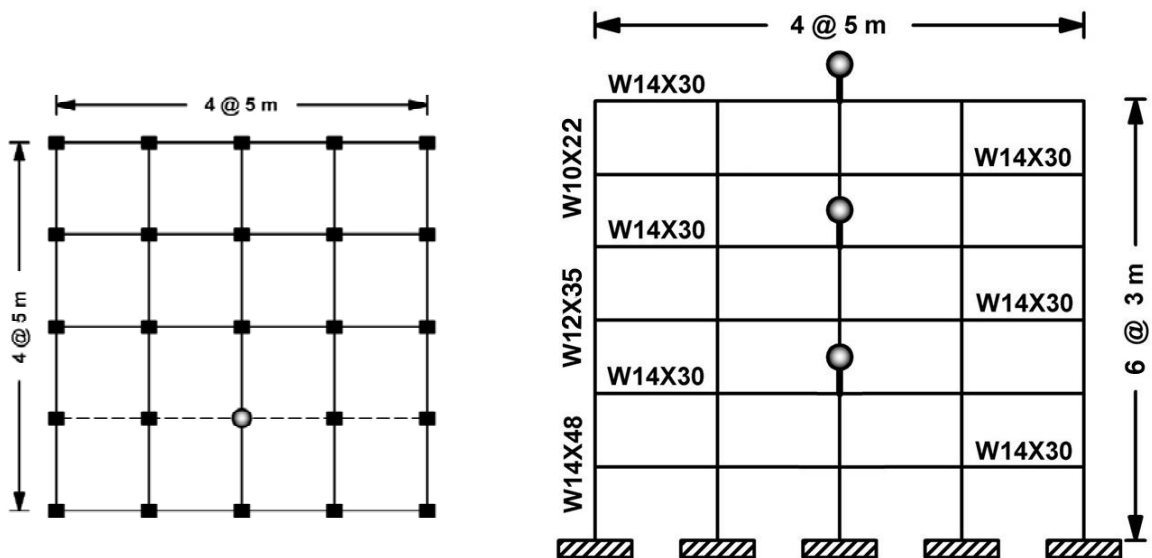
6-story building typical floor plan (left) and interior frame (right) with nonstructural components attached to its lower, middle or top floor.
